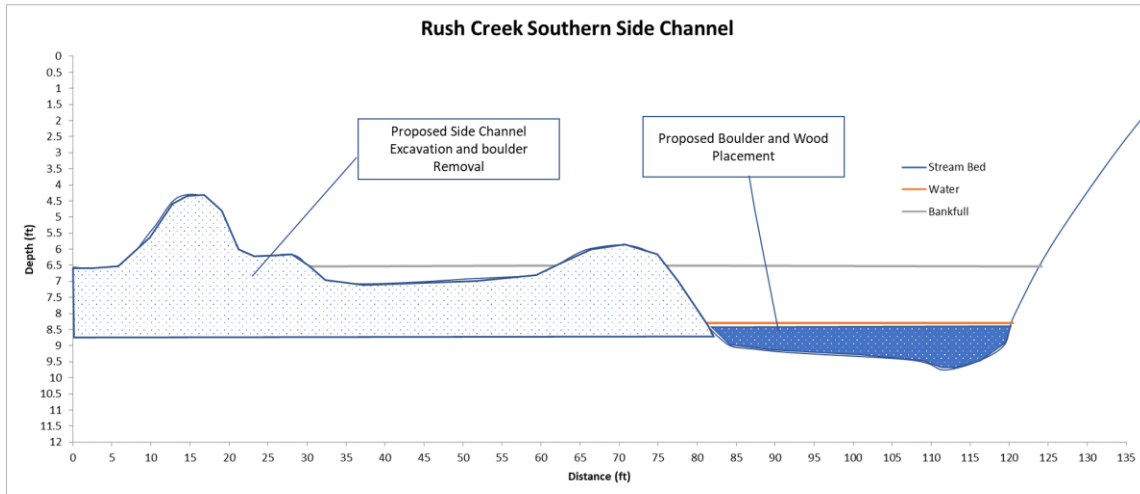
Proposed excavation and boulder placement cross-sectional profile of Rush Creek southern side channel.
